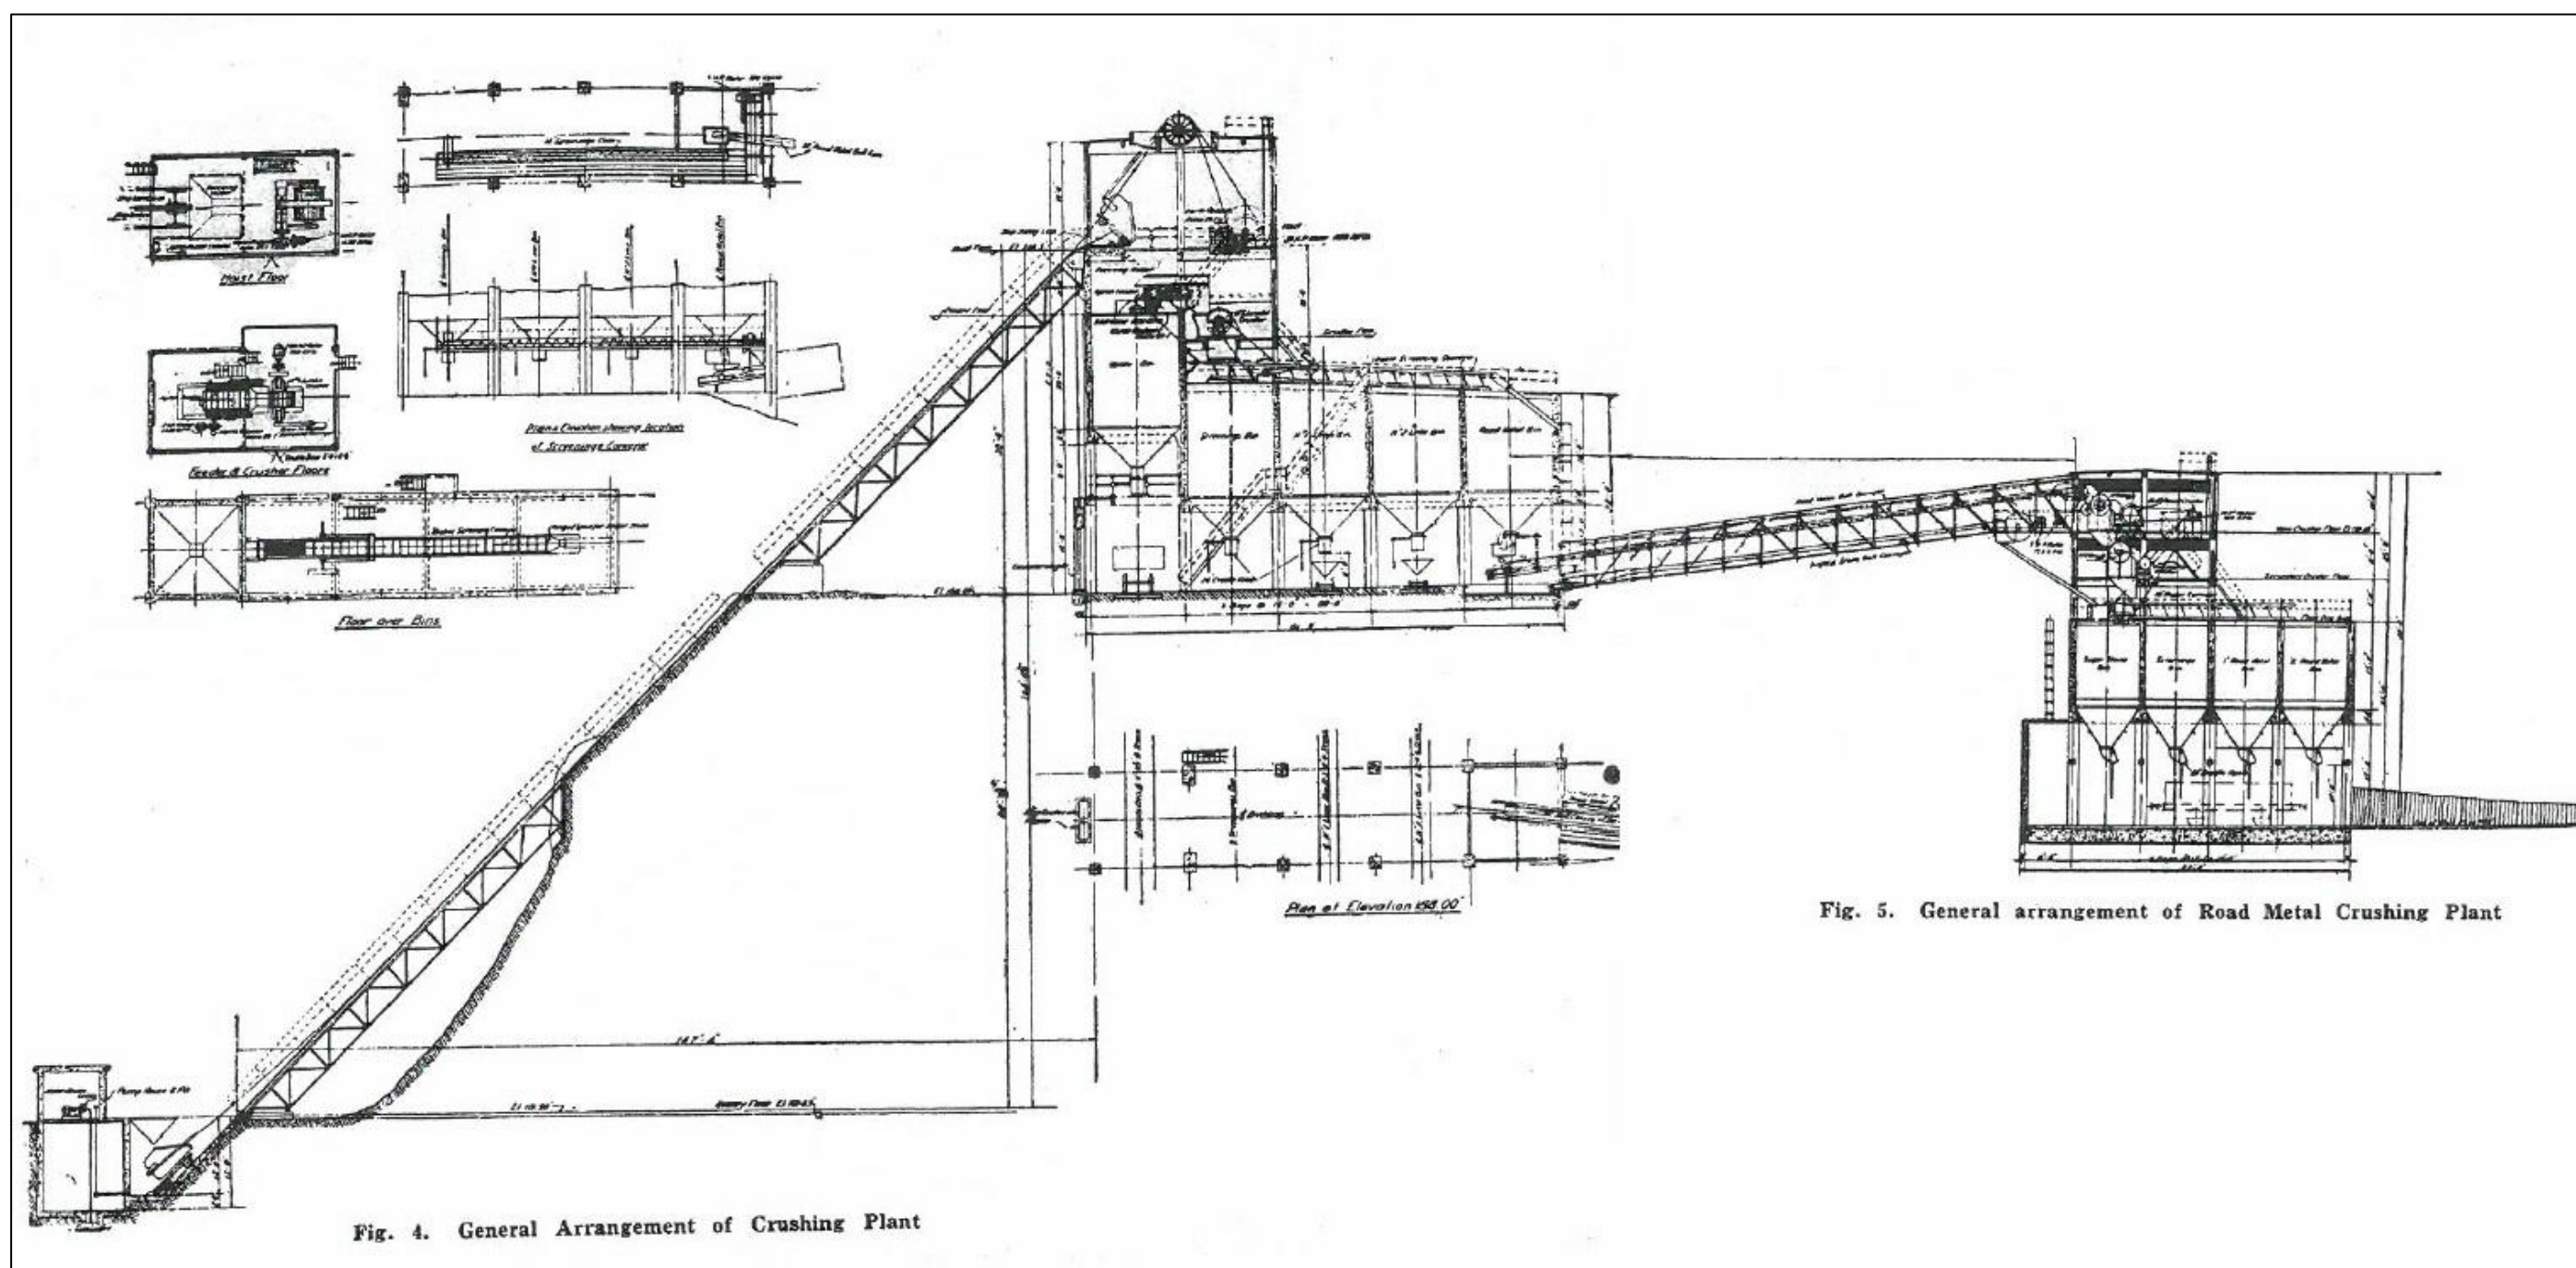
Cross sectional elevation showing, from left, the hoist incline, the primary crushing plant and the road metal plant
